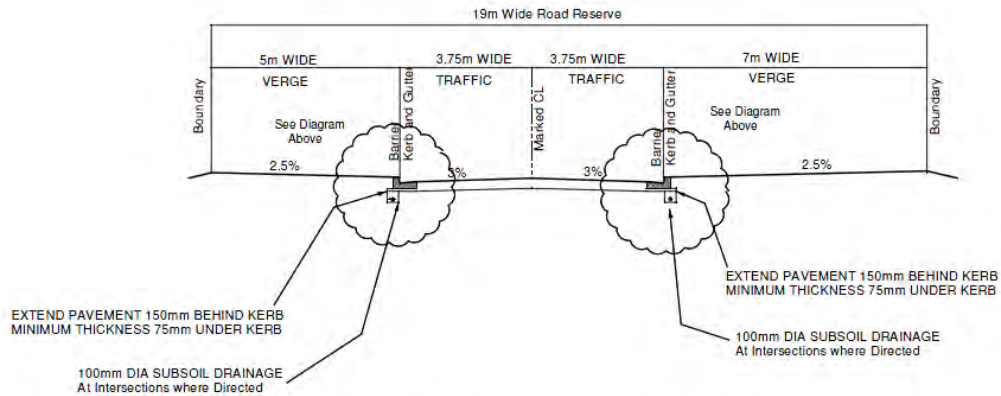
TYPICAL CROSS SECTION ROAD 5
